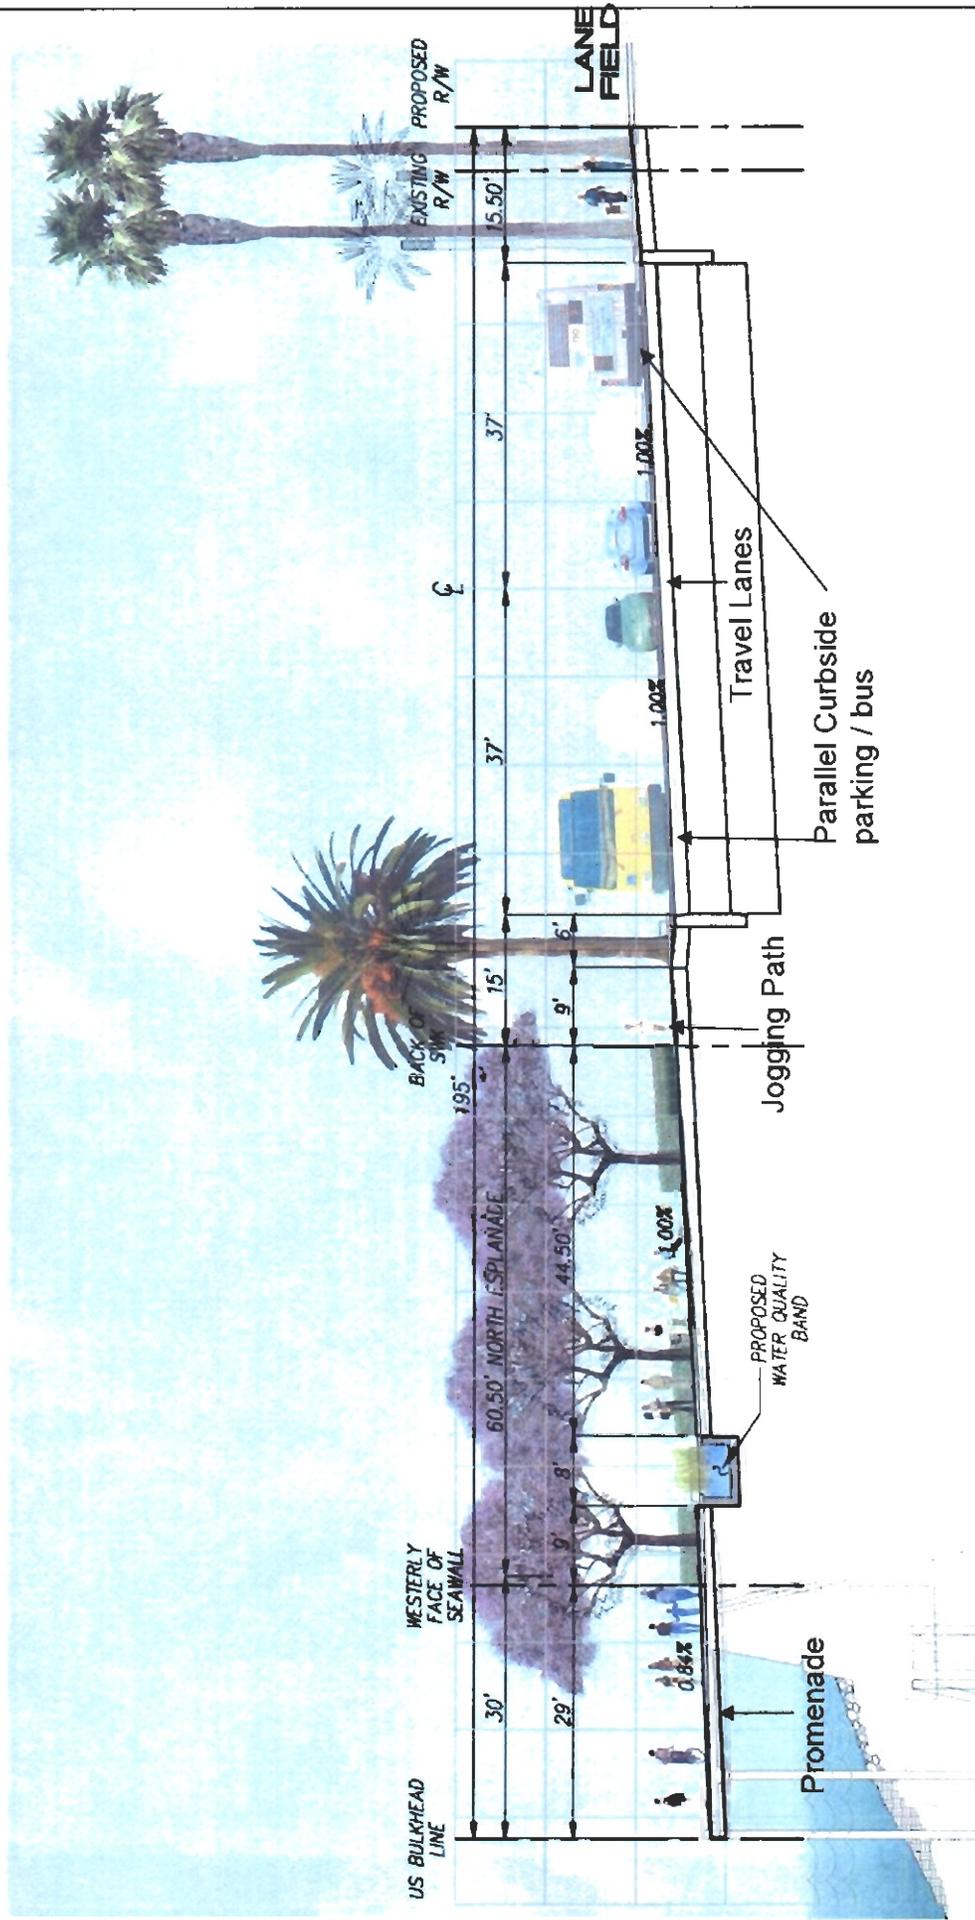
# Exhibit A – North Harbor Drive and Broadway Improvements, Site Plan
